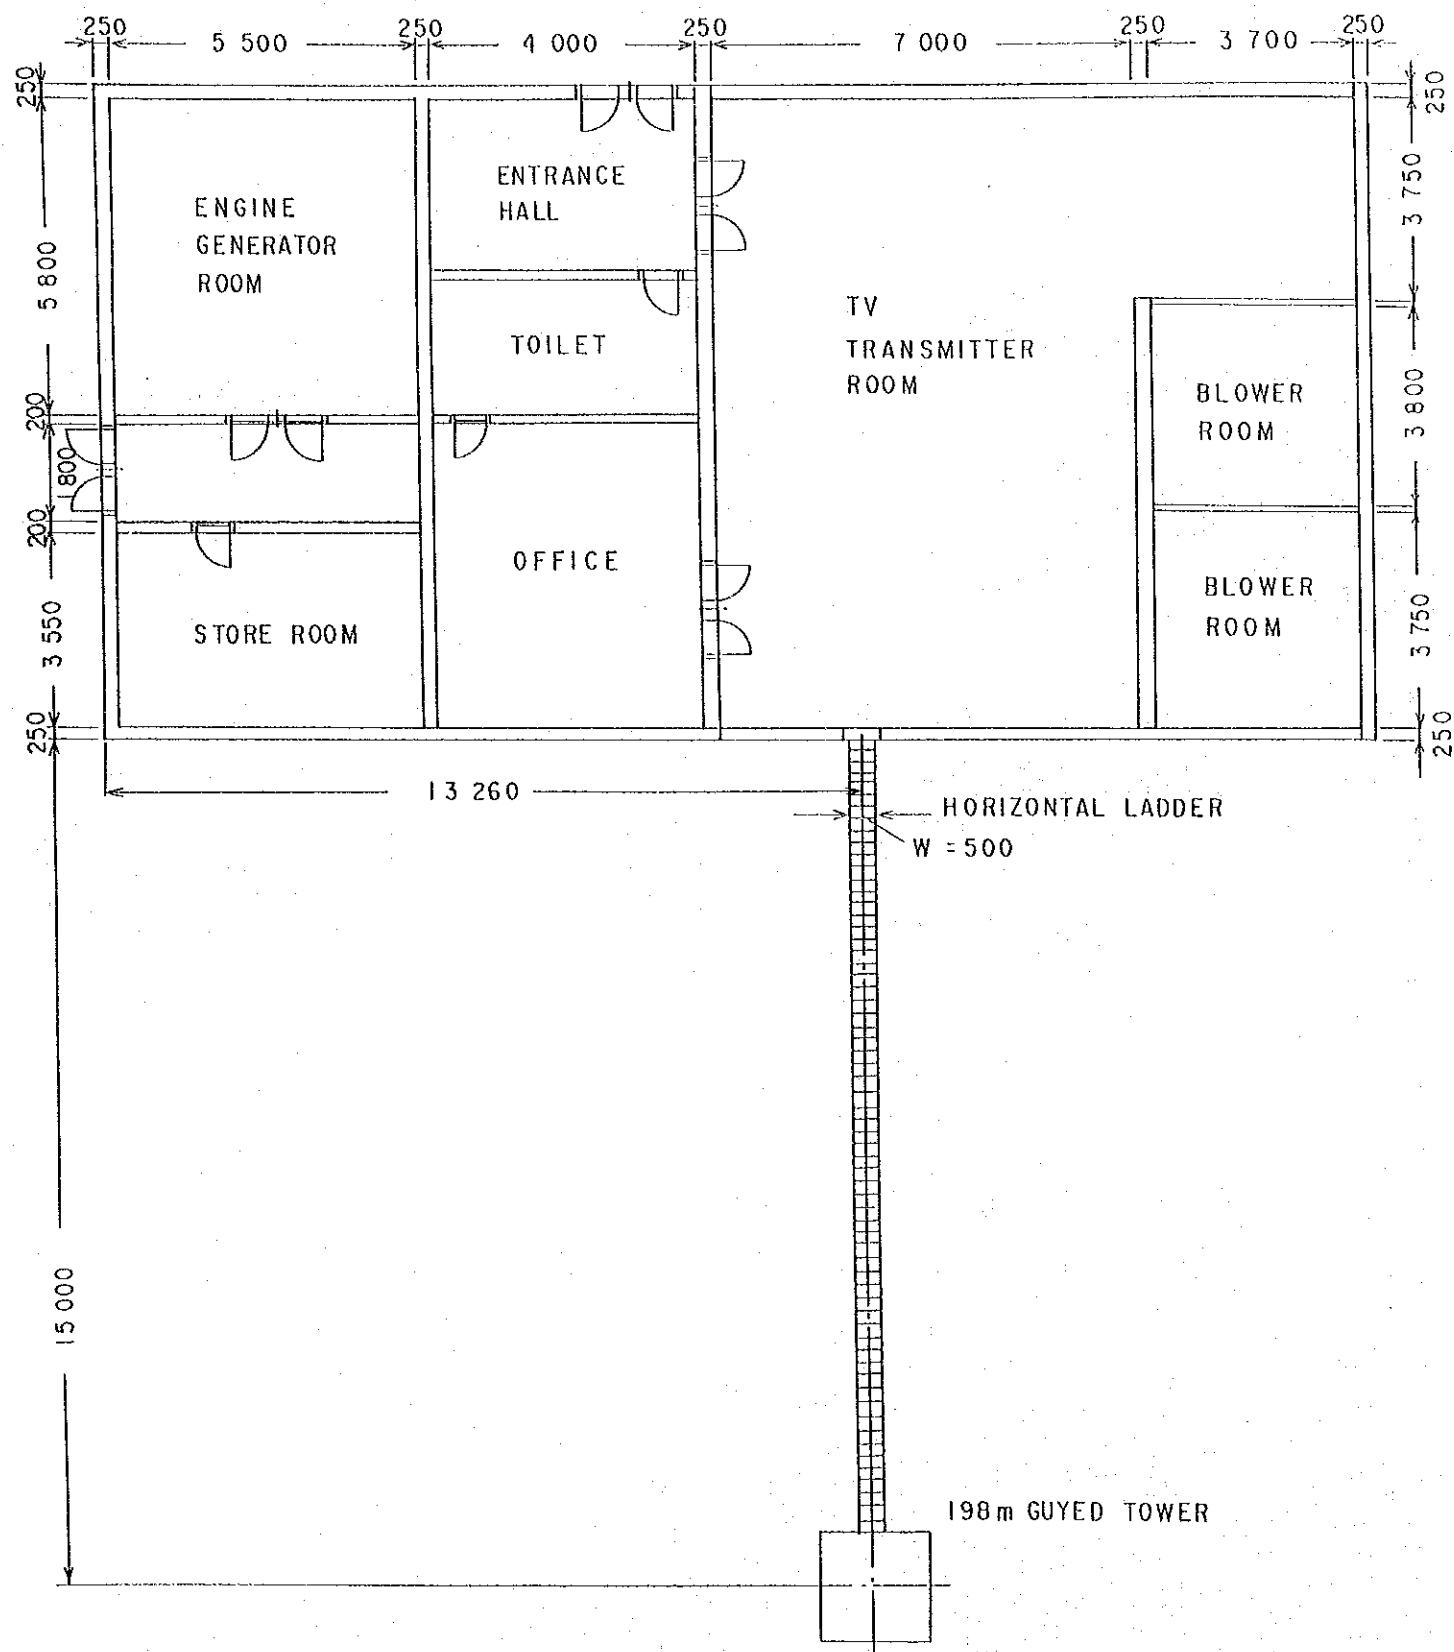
SITE LAYOUT FOR NEW HASSAKE STATION
